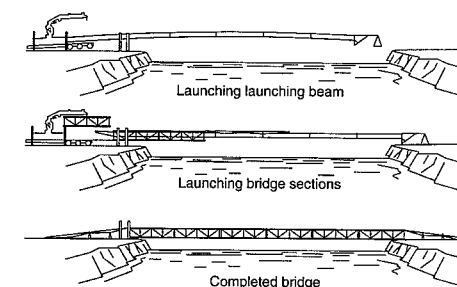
Launching procedure of the Fast Bridge 48
